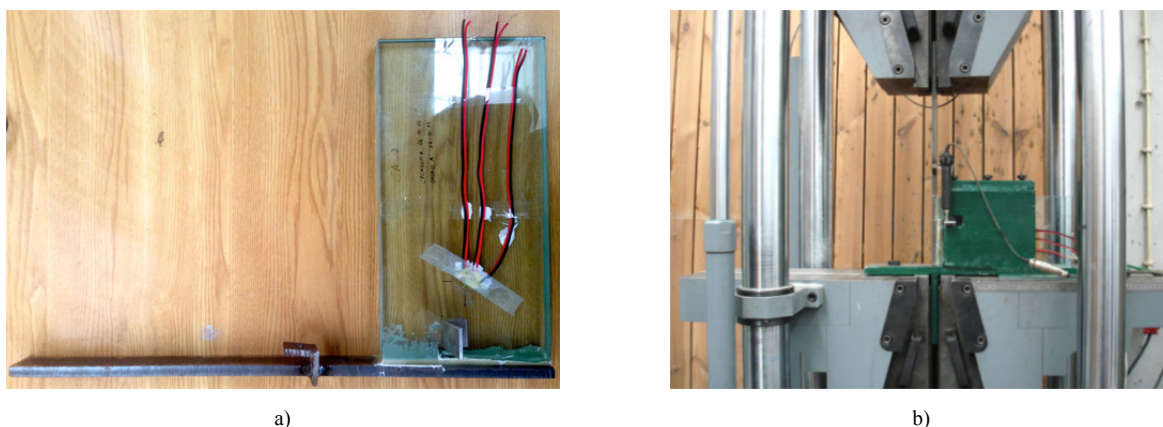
Push-Out shear test a) test specimen (front view) b) test set up (lateral view).
